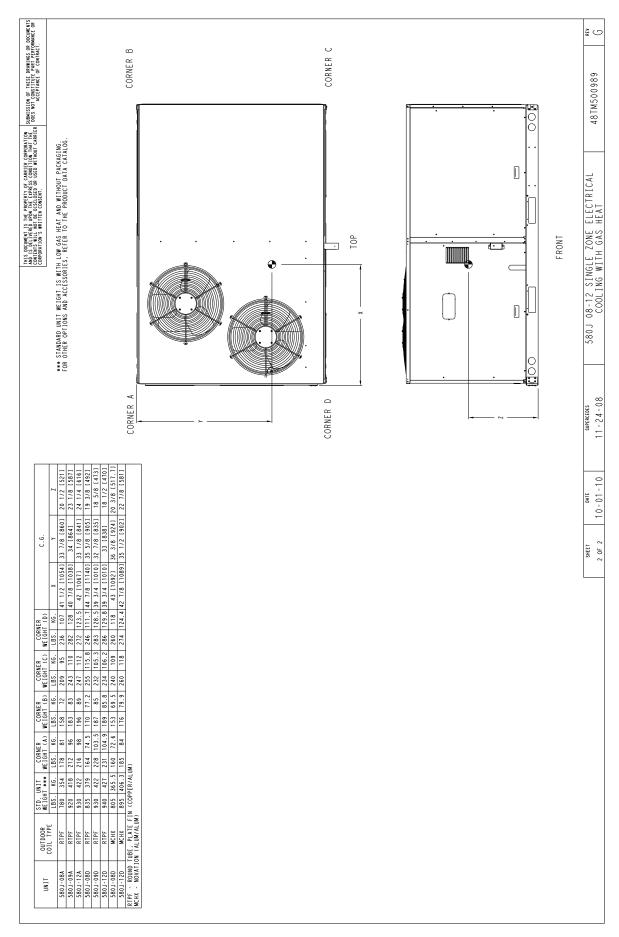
Unit Dimensional Drawing Sizes 08, 09, and 12 (cont)
